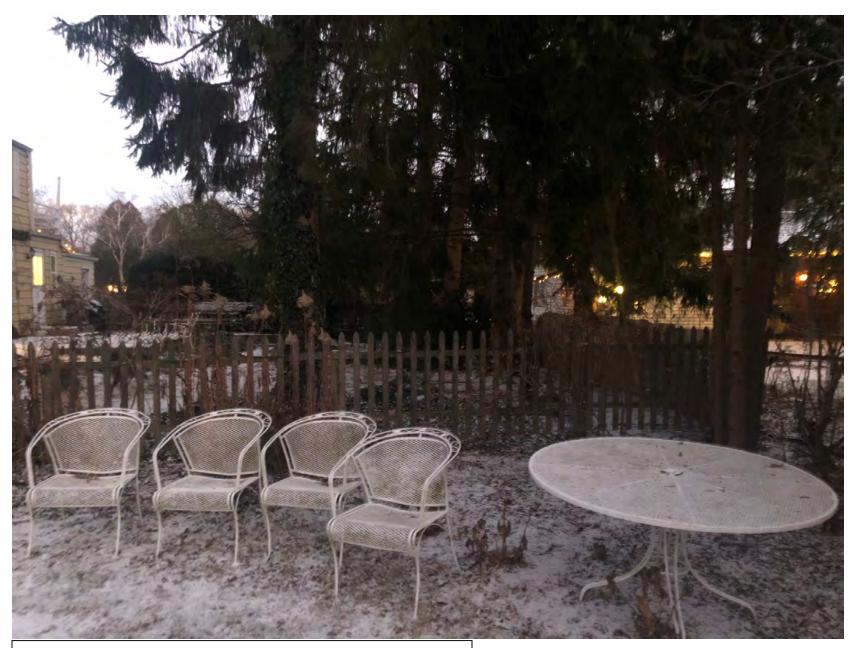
REAR YARD – EXISTING FENCE TO BE REMOVED – FACING EAST
